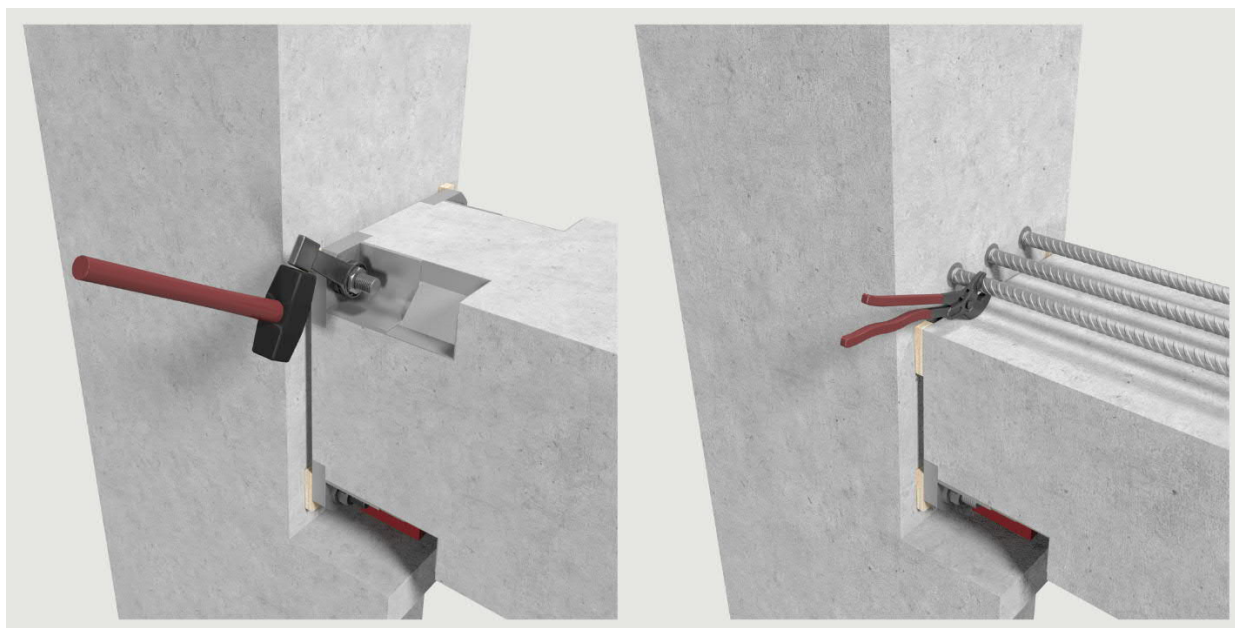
Erecting the beam and tightening the shoe-to-rebar coupler connection screws
